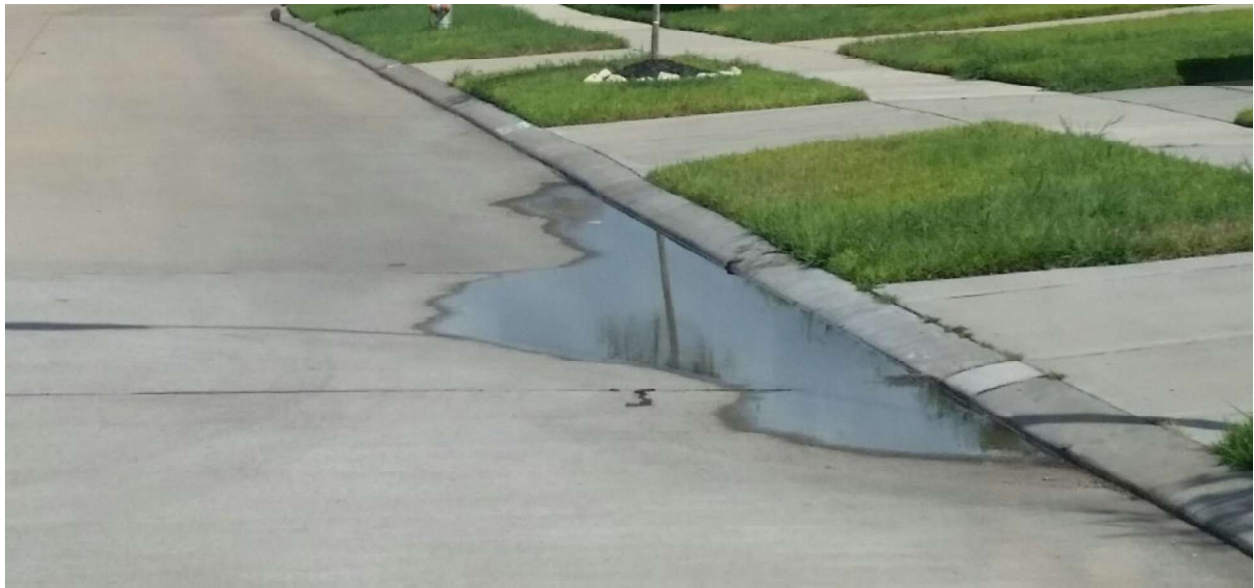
Bird bath has significant length, width, and depth. Lifting or pavement replacement is required. If the lifted pavement cracks then use Concrete Pavement Cracking Evaluation Criteria included in this document.
